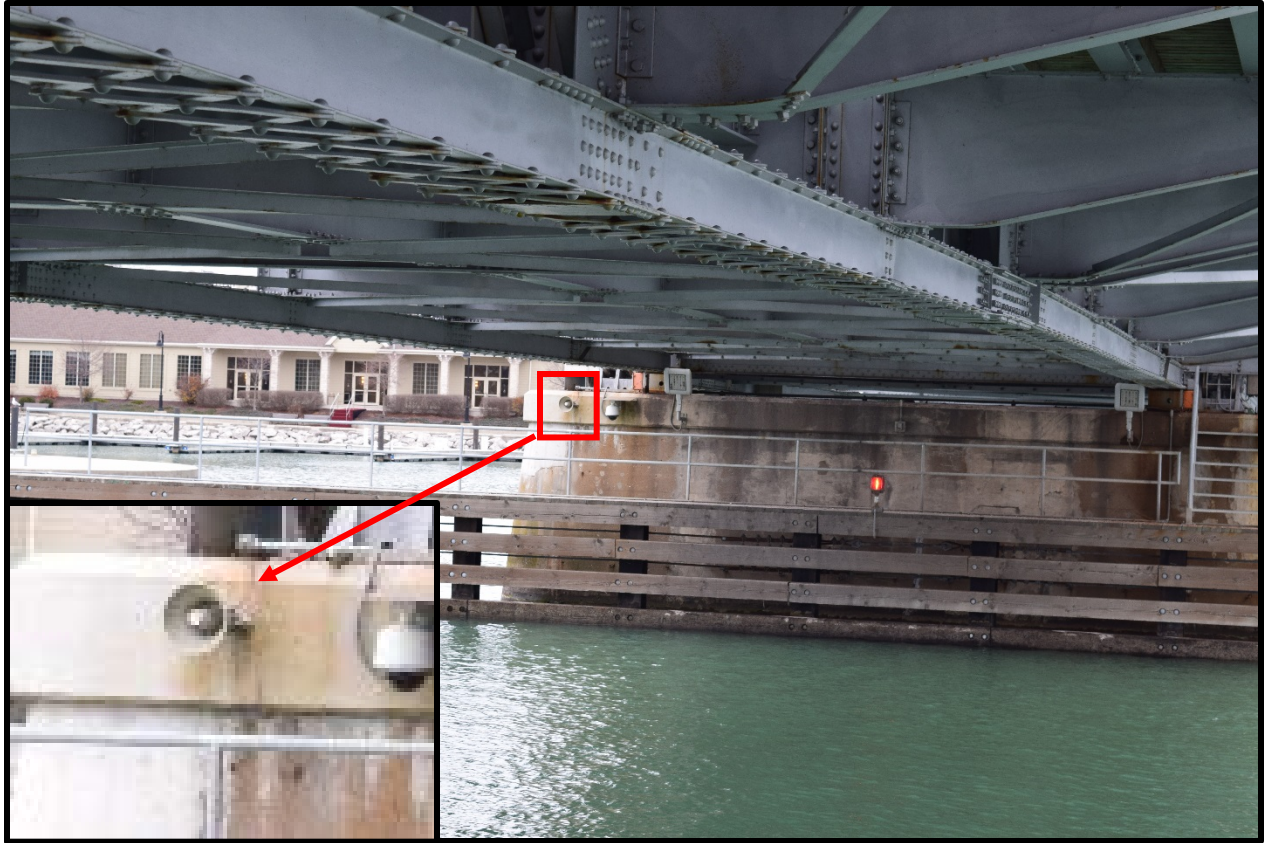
Michigan Street Bridge microphone and speaker system located under the drawbridge on the drawbridge pier.
